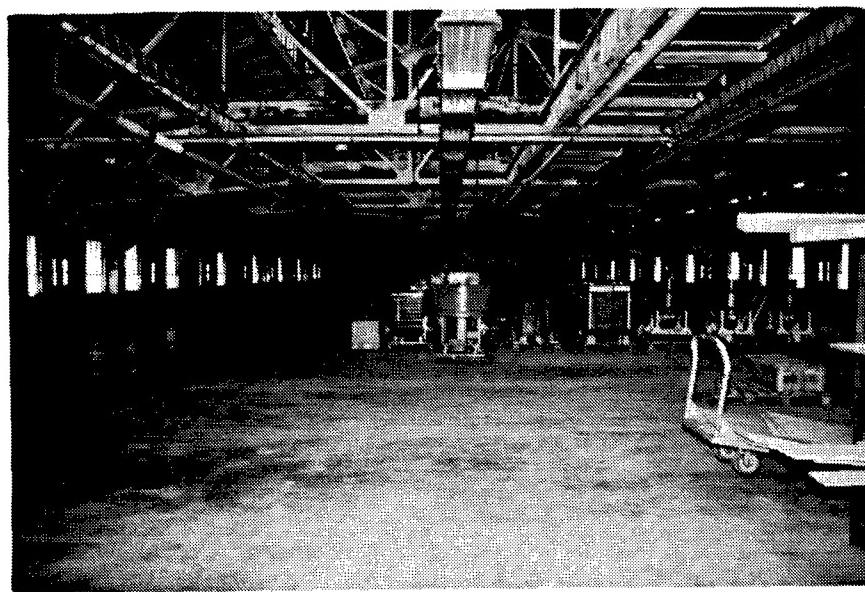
Building 2F-11: Interior view of this Fuze Assembling Building.
